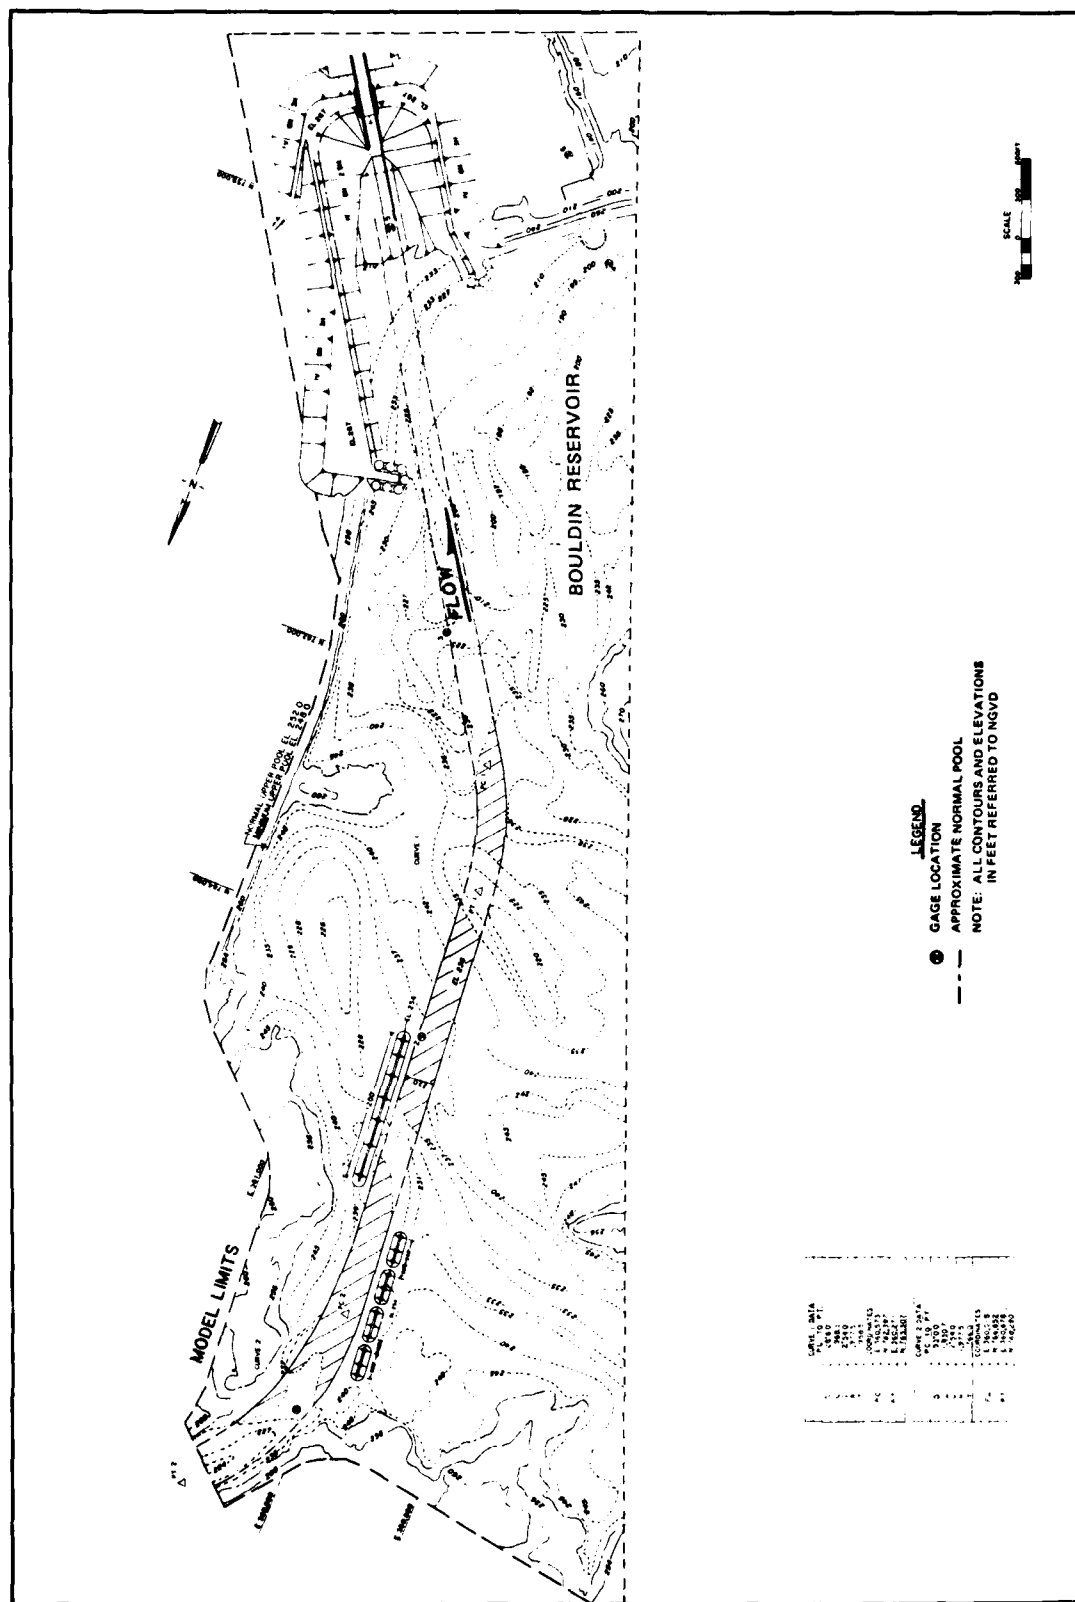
Boulder Lock and Dam, Model A, Plan B-3
